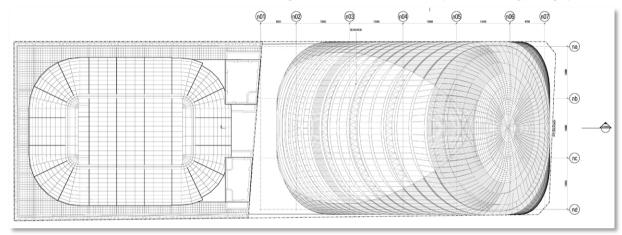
North Site Roof Plan (Tower Building on Right)
